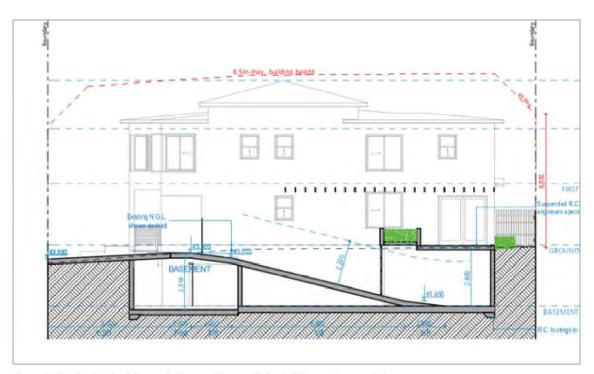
Section A extract demonstrating consistency with the building envelope control Source: Designcorp Architects
